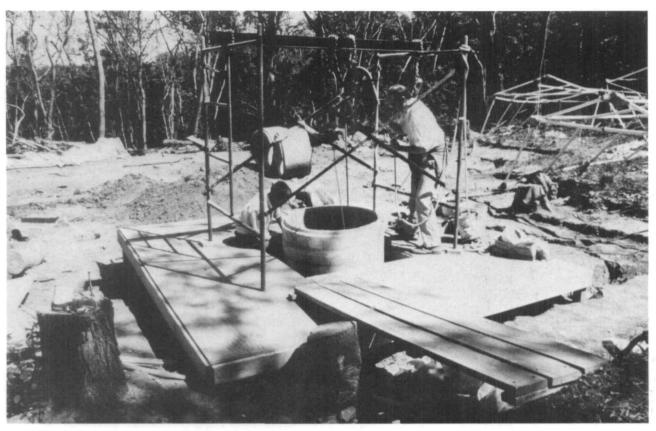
Area I Well Excavation, Illustrating Platform Scaffolding, and Concrete Well Rings in Place.
